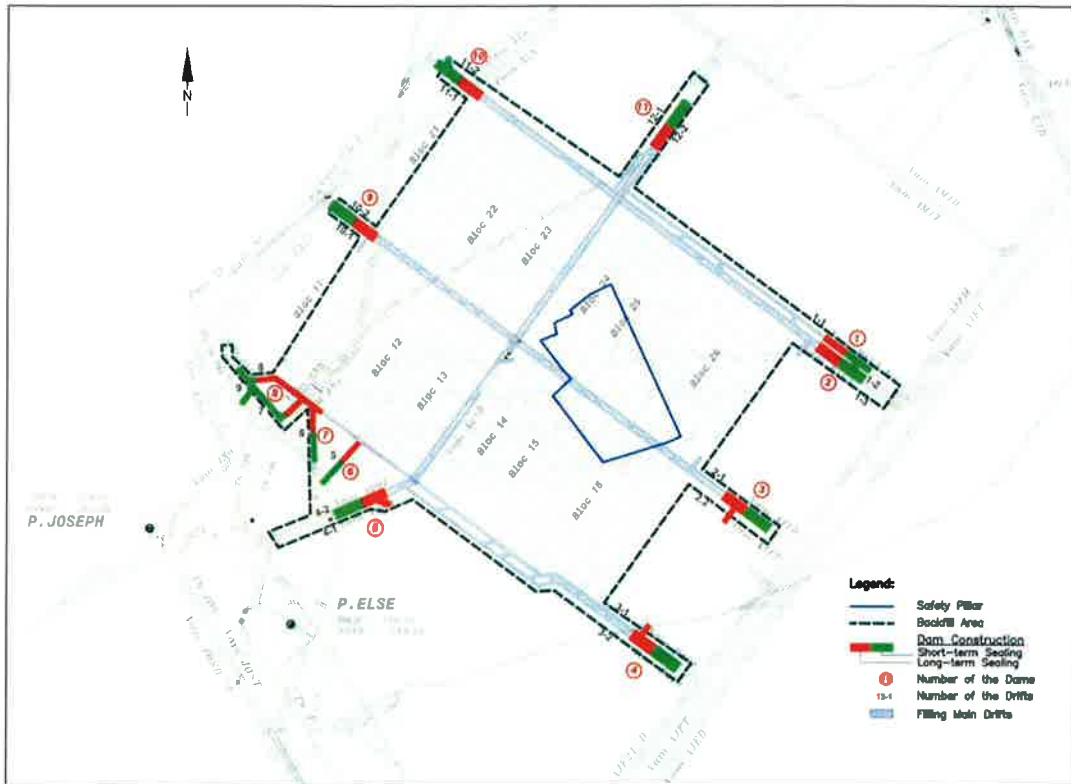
Overview of the Location of the Planned Dams as well as the Main Drifts that are to be Backfilled
